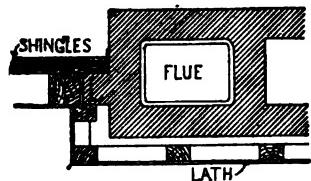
Furring Around Chimney Projecting Through Frame Wall.
